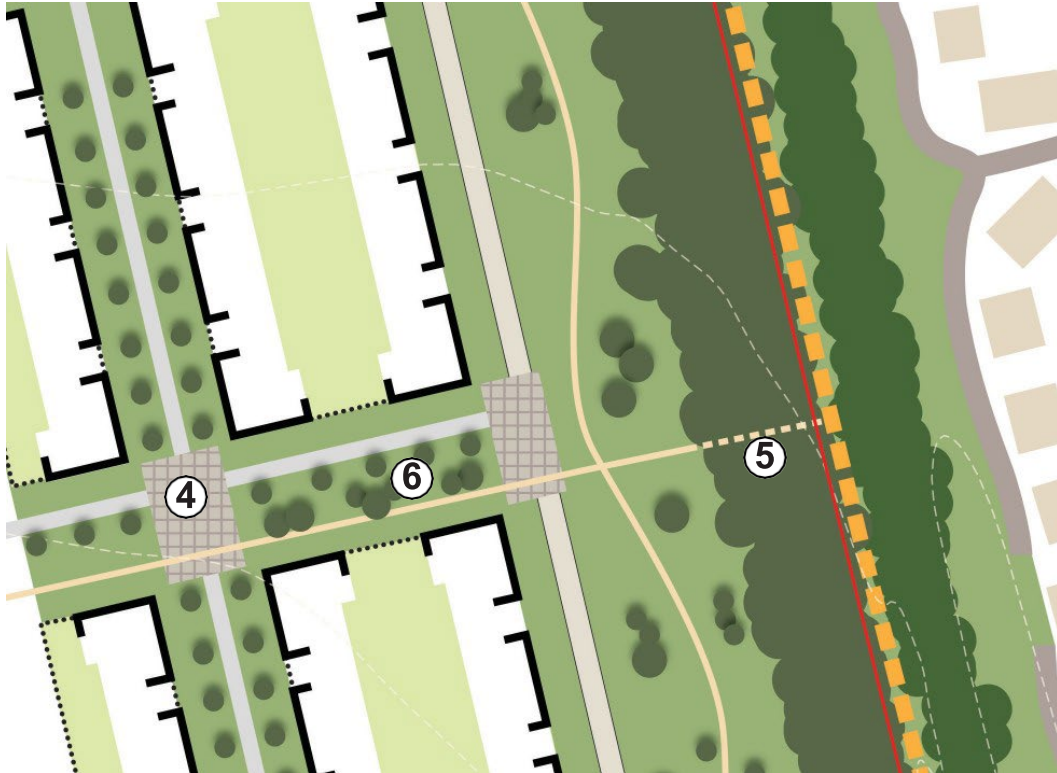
Design principles for Eastern Edge (North of Shenley Road)
